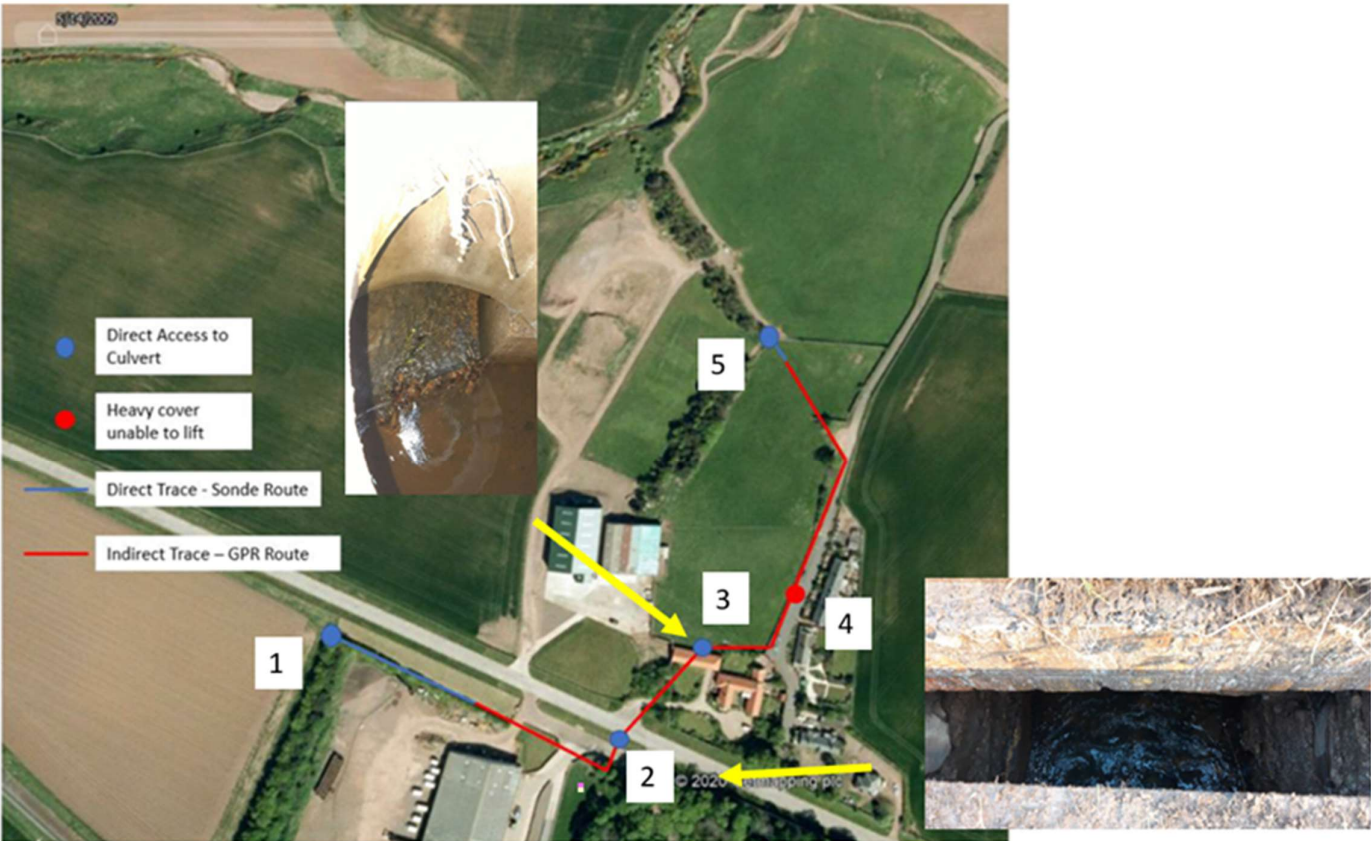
Old A1 / Skateraw culvert entry (900mm concrete pipe)
